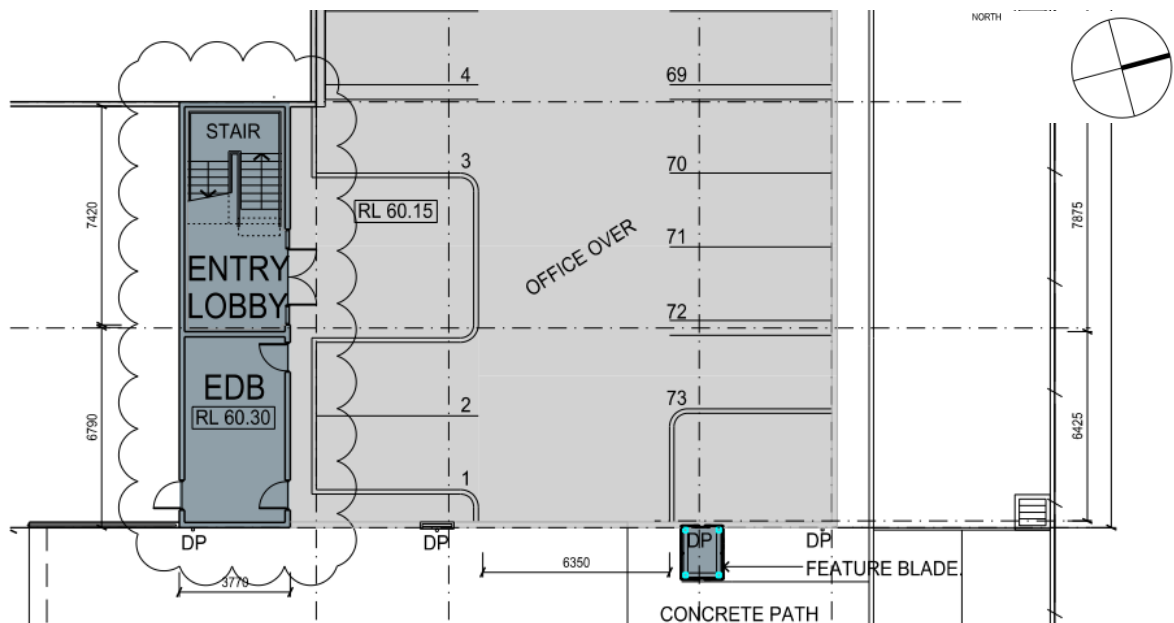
Pedestrian Access to the Site from Basement Car Park (Source: SBA Architects)
